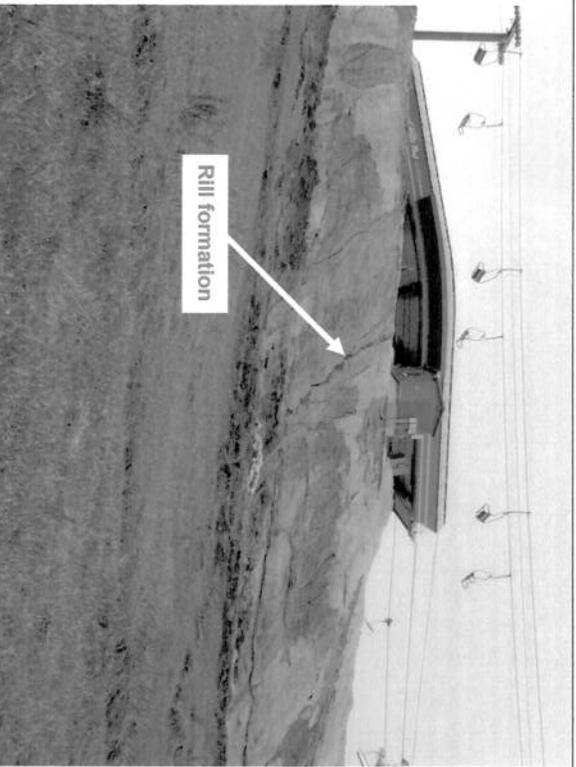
NW corner of site. Looking SE at diversion ditch.
